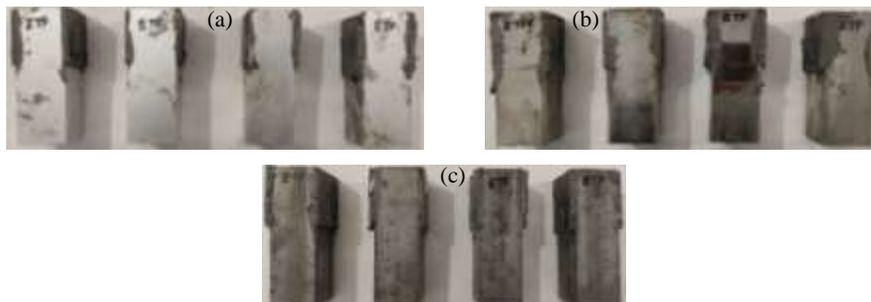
CFRP plate strengthened (a) Aluminium, (b) Stainless steel and (c) Mild steel specimen for ETF test specimens
